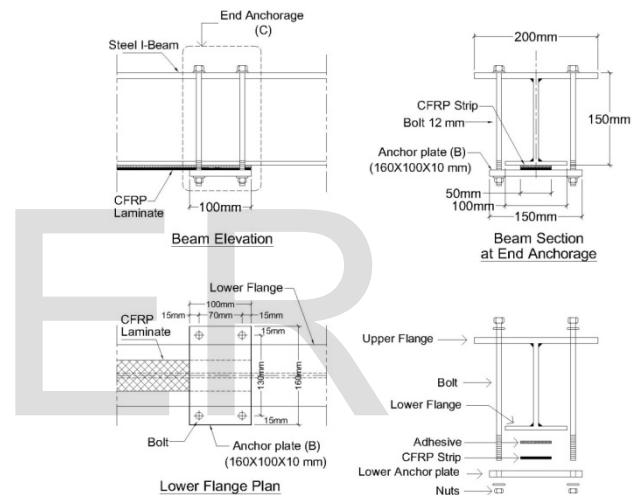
Configuration of anchorage system type (C) – Beam STC
